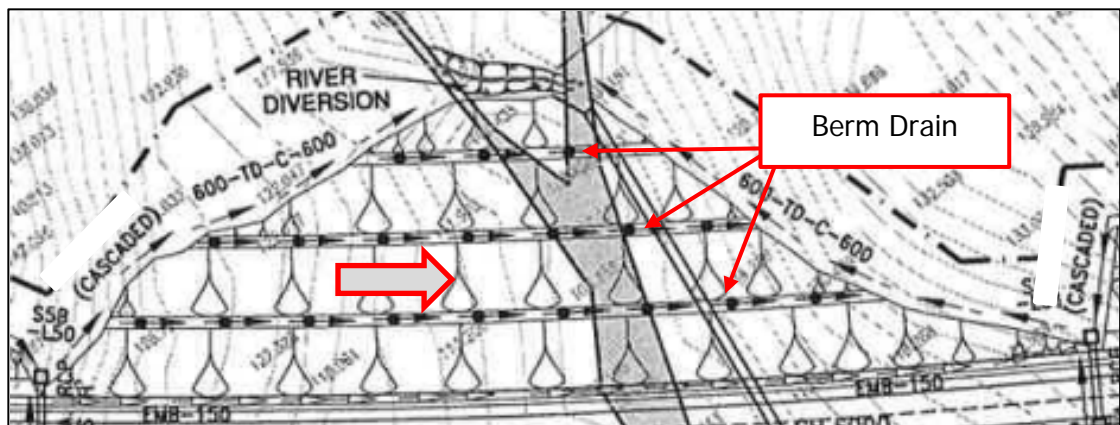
Berm drain for fill section. Direction water flows from maximum point in design profile.
